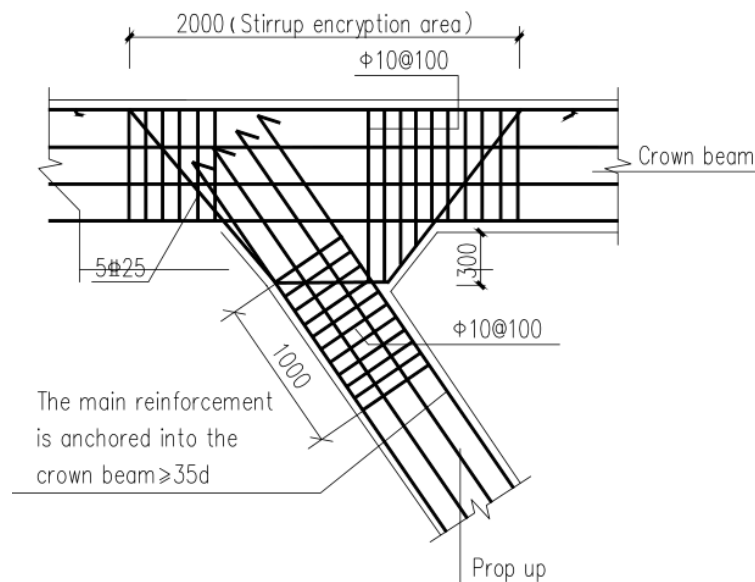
Construction drawings of angular braces/diagonal braces and crown joints.
